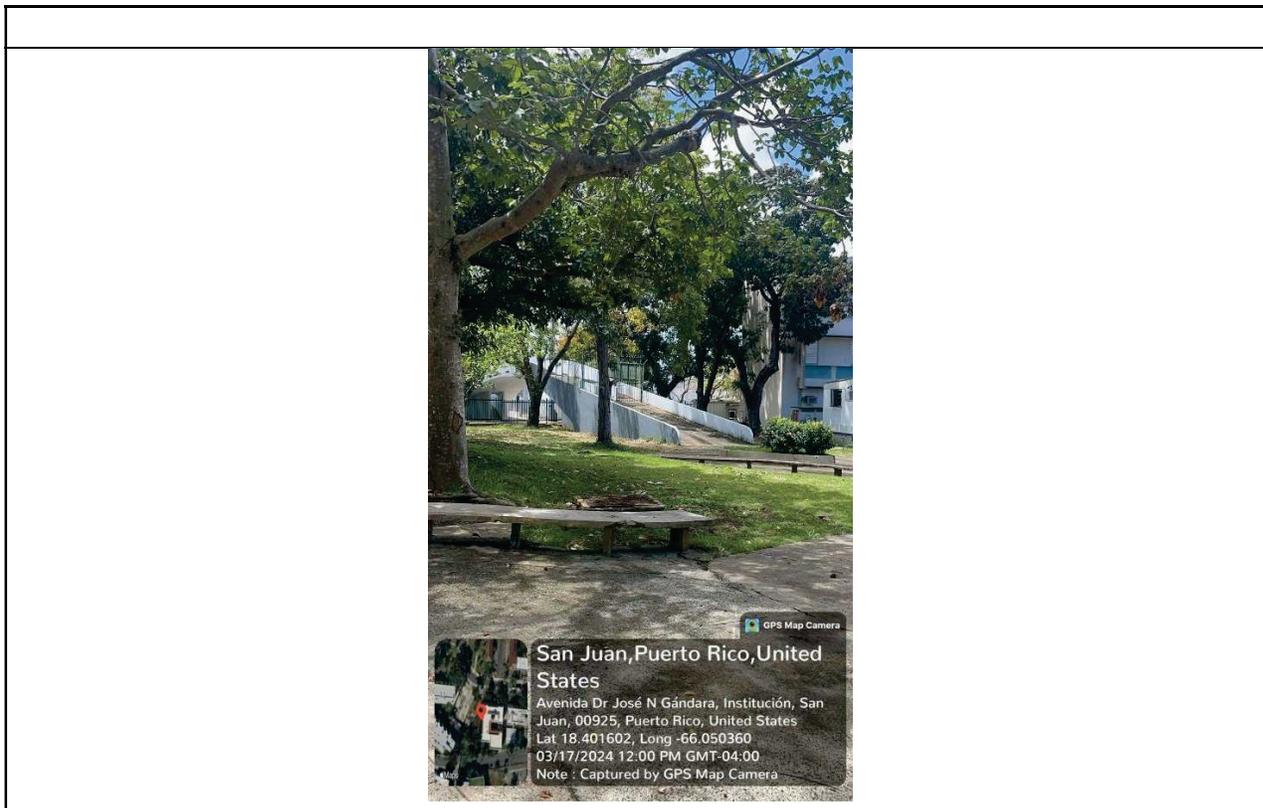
Northeast side view of Henry Klumb bridge; taken from UPR Rio Piedras Campus, looking southwest.
